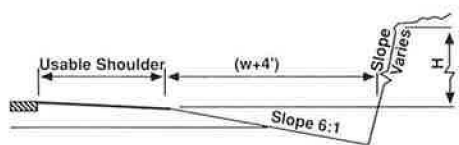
Roadway section on rock slope—Design A, Stage 1.
